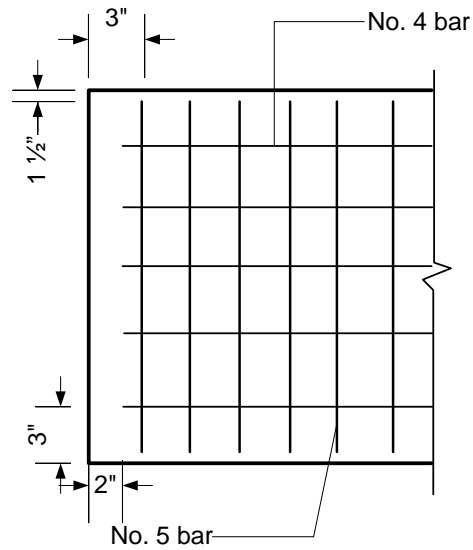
CIP slab reinforcement layout for slab beam (plan view)
